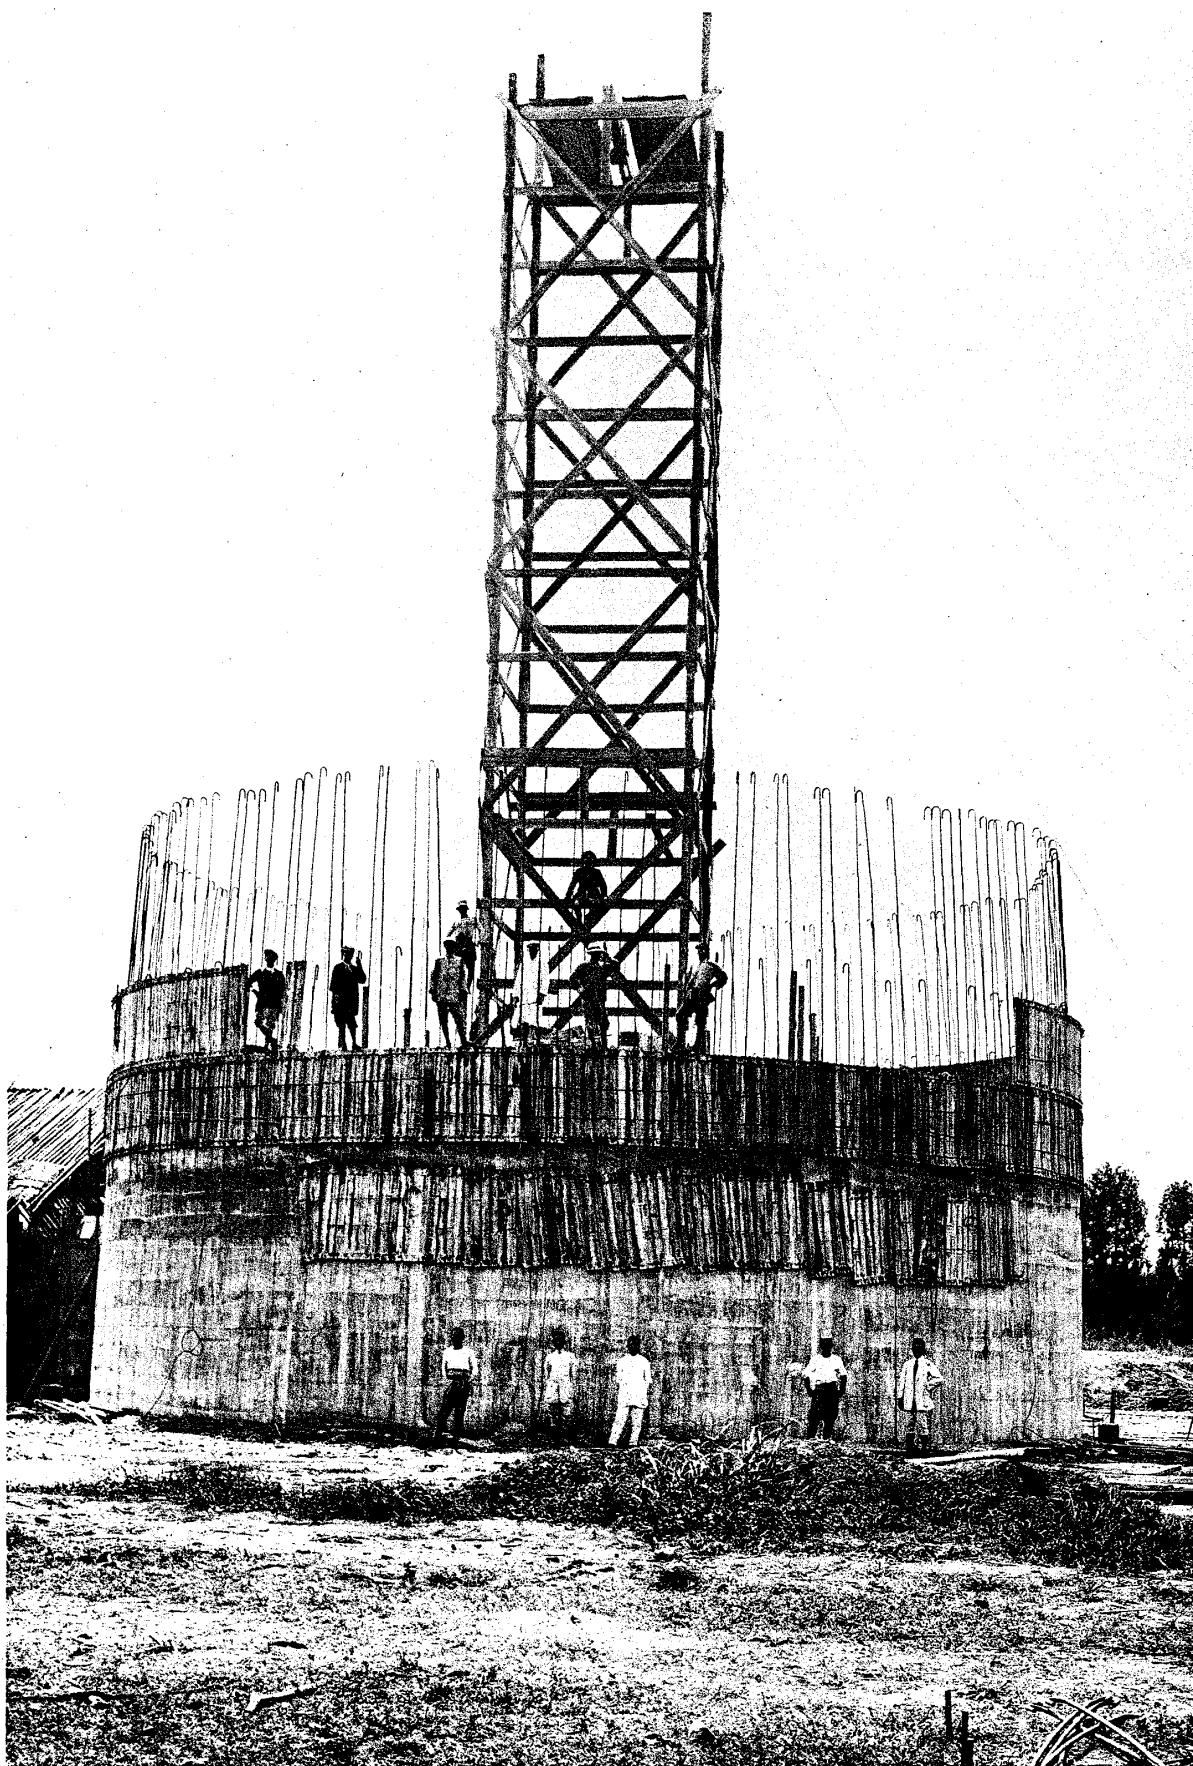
The Haranomachi Wireless Tower at an early stage of construction.
